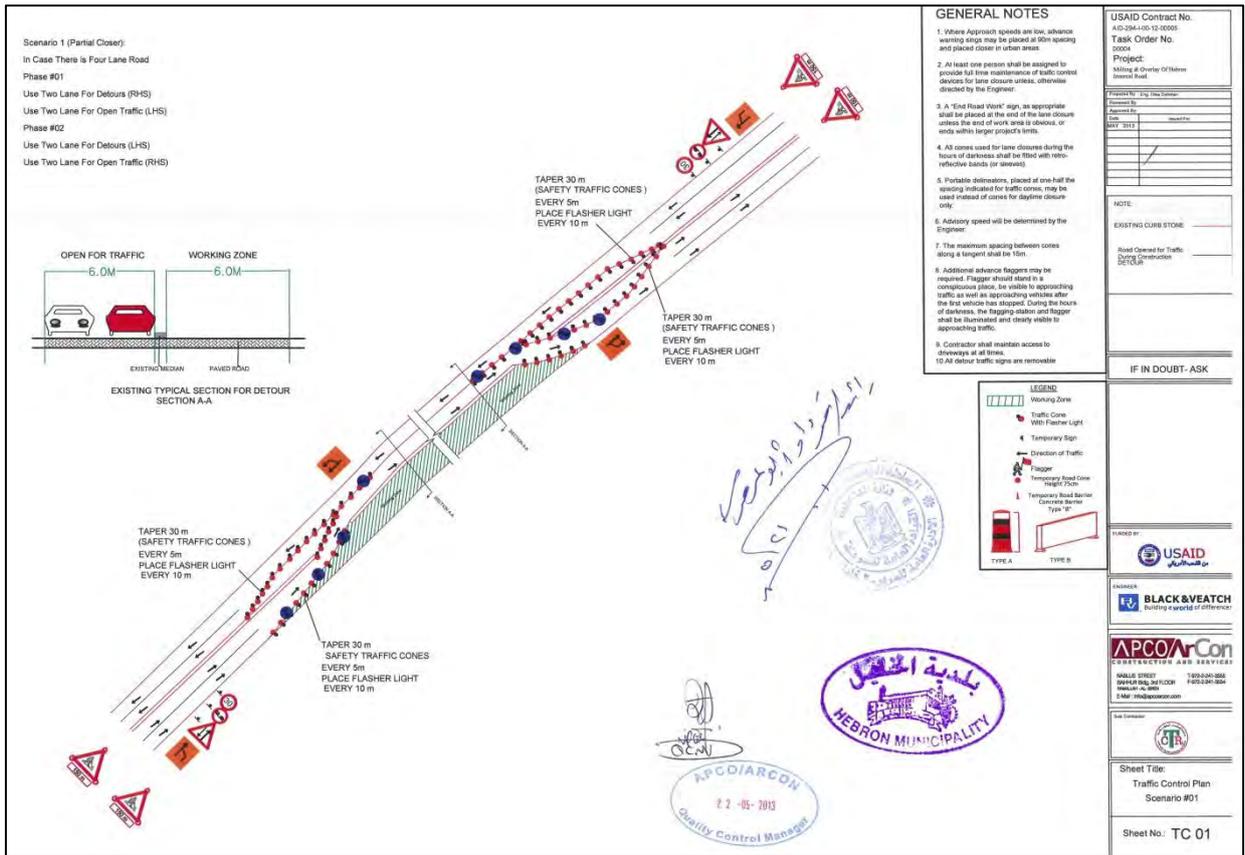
Project 06-THR- Sample sheet of approved traffic control plan – Segment B.
